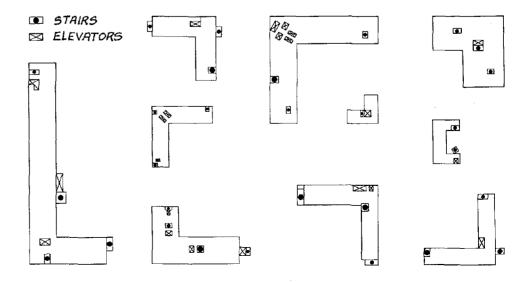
Schematic plans of existing L-shaped buildings illustrating recurring patterns of the location of vertical circulation elements. The corner and the wing at left were built at a different time than the wing on the right. Poor materials and reinforcing details have also been cited as contributing factors. Bailey Willis and Henry Dewell noted at the time that (5), "The failure was presumably determined by the shape of the ground plan and by its position relative to the earthquake shock."
